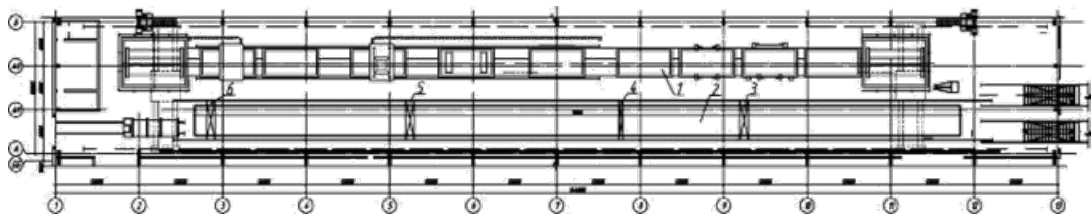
Forming Plan of span No. 3 (2nd start-up complex modernizations)
